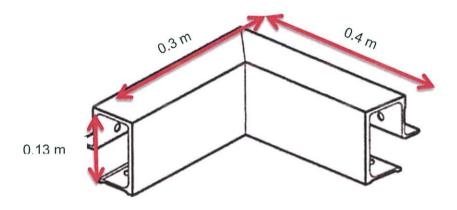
External Soffit Corner Source: architectjaved.com (n.d)
